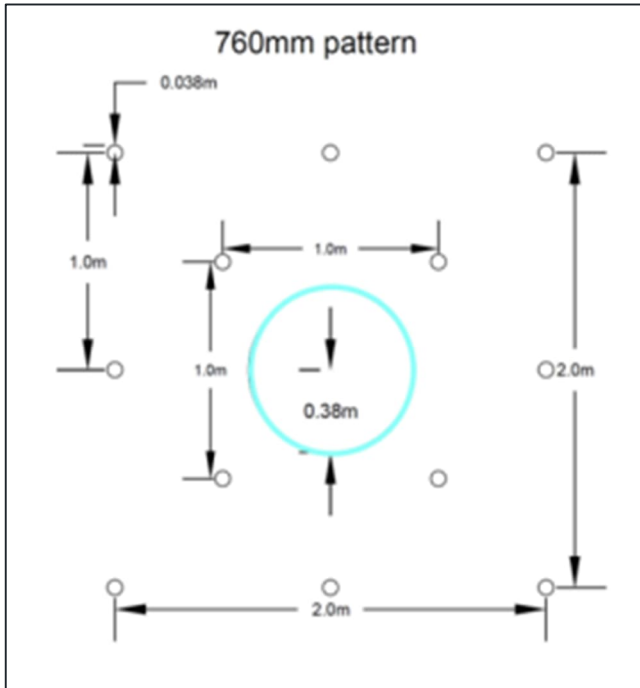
Planned Slot Raise Drill Configuration (After Dong, 2019)
